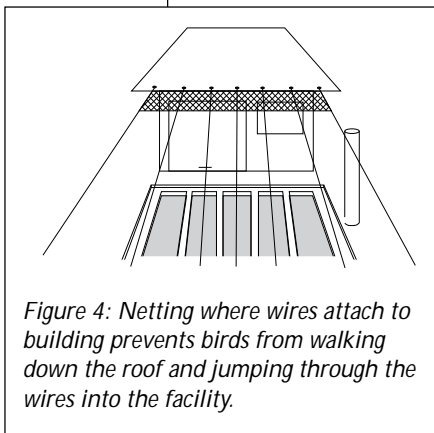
Netting where wires attach to building prevents birds from walking down the roof and jumping through the wires into the facility.
